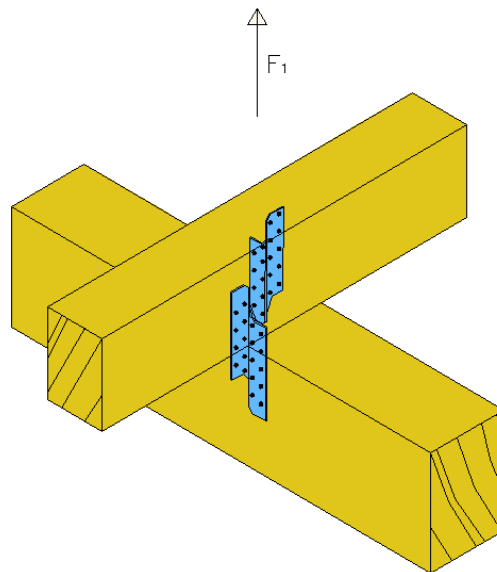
Forces - Beam to beam connection with purlin ties ( $F_1$ )
